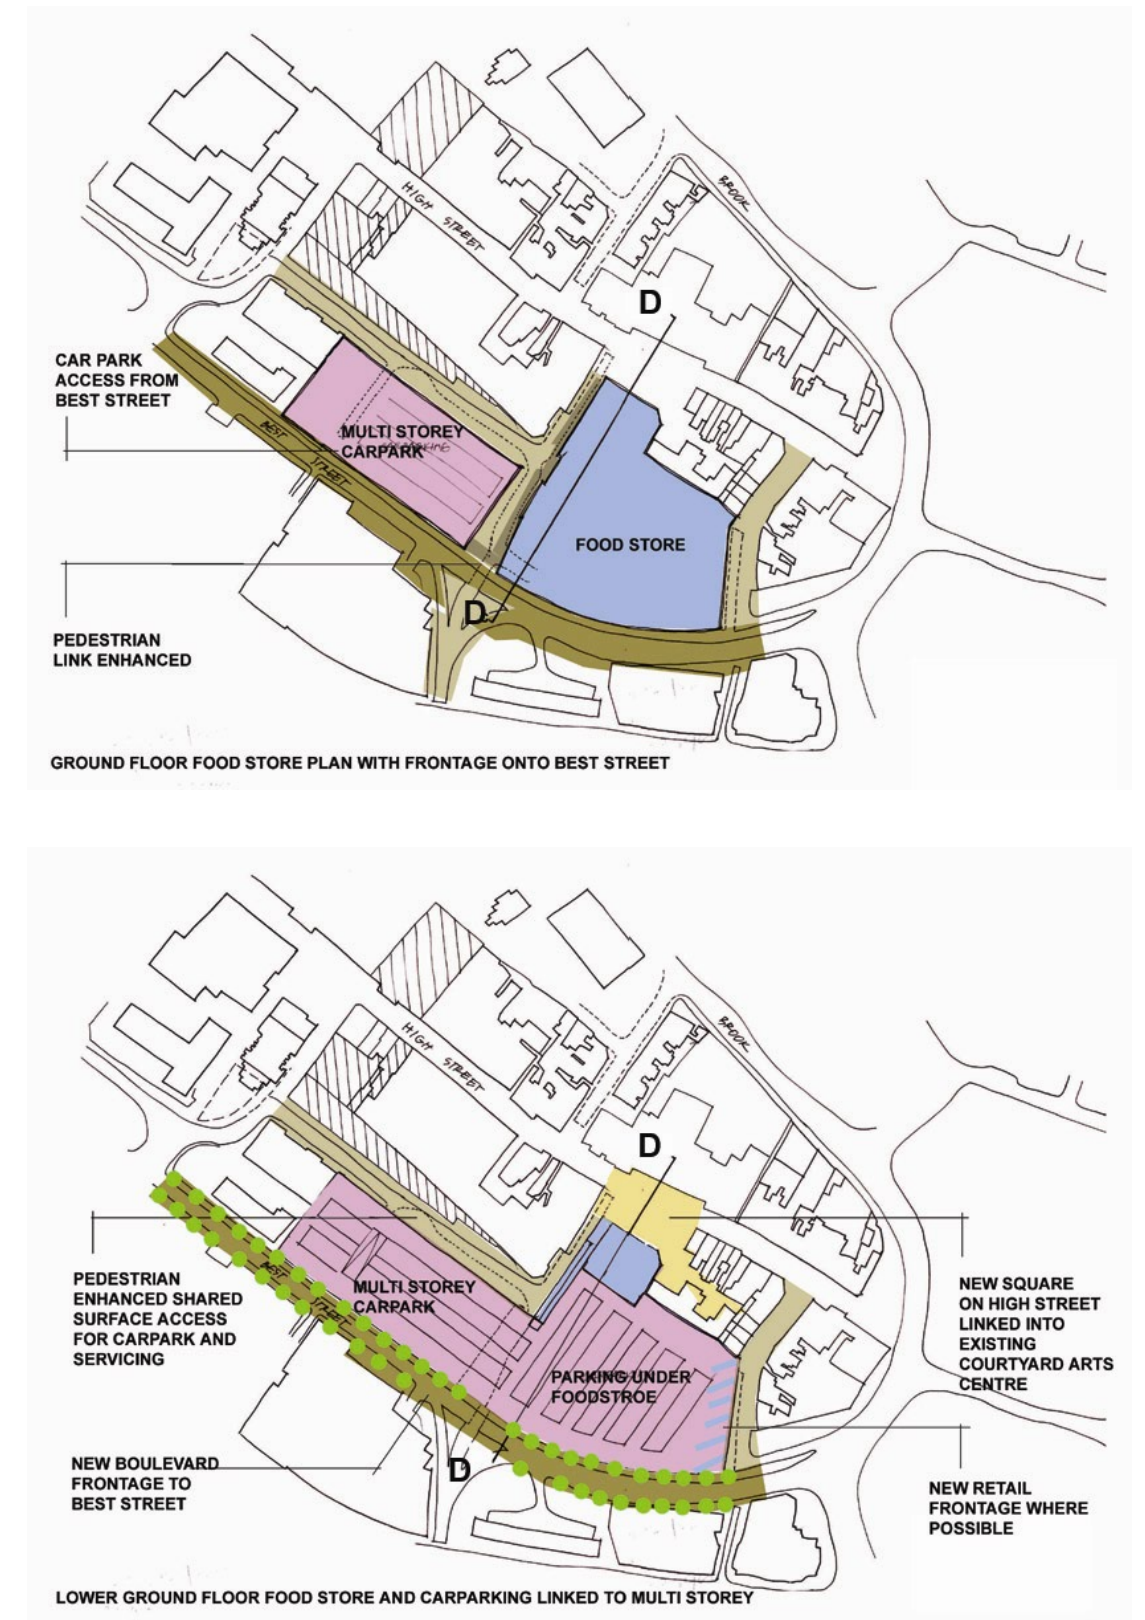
Ground Floor (top) and Lower Ground Floor (bottom) plans for the proposed food store
